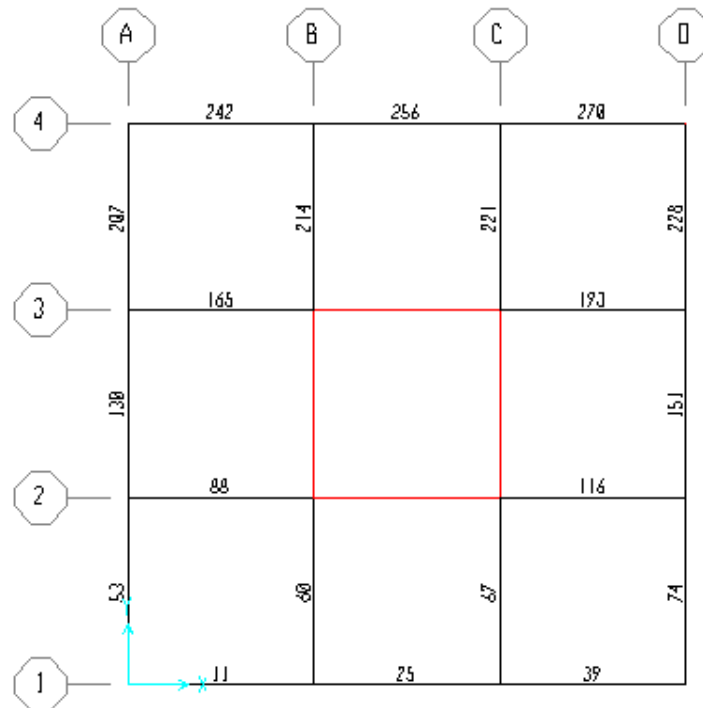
Frame layout and beam no. on the XY plane at Z=9.60m of G+5 building
